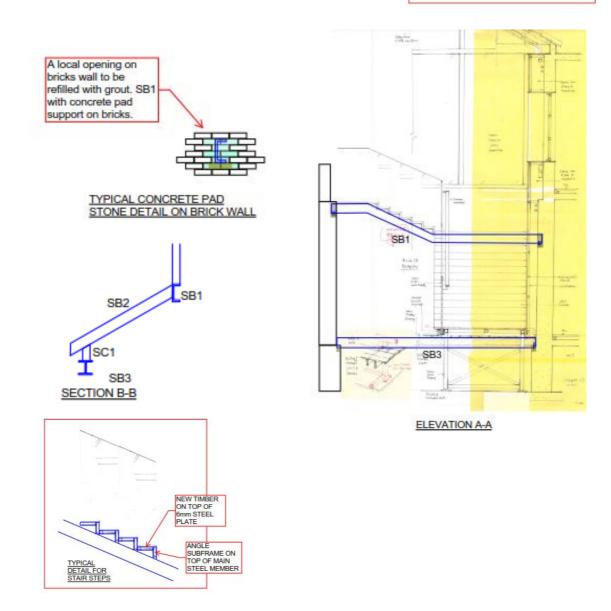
Option 2 Steel Beam on Brick Wall Option (Plan, section & details)
